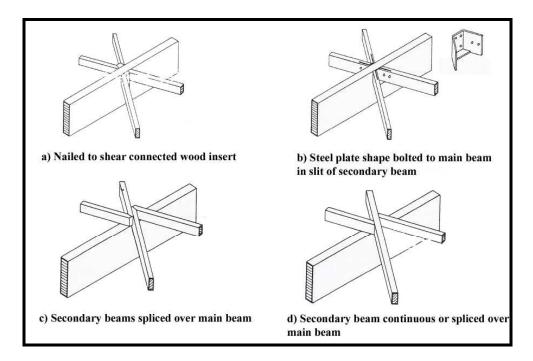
Secondary girders are placed on main girders in various alternatives with 60° (Götz *et al.*, 1989:107).
